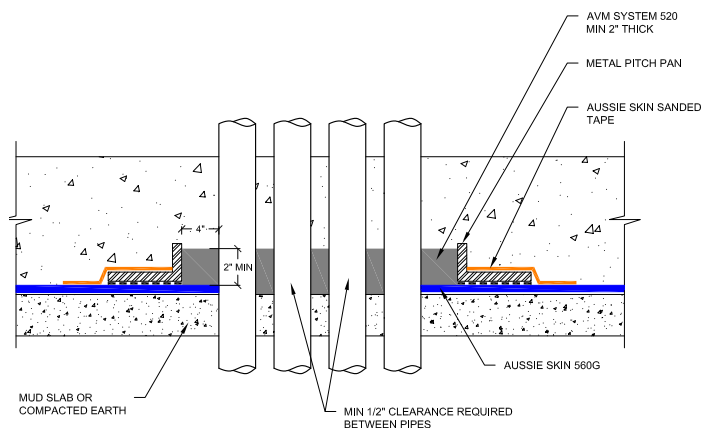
PITCH PAN PIPE BANK DETAIL
